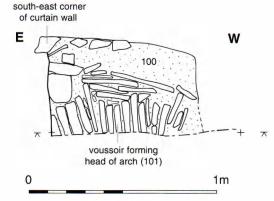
Plan of the south-east corner of the medieval curtain wall exposed in Trench 1.
